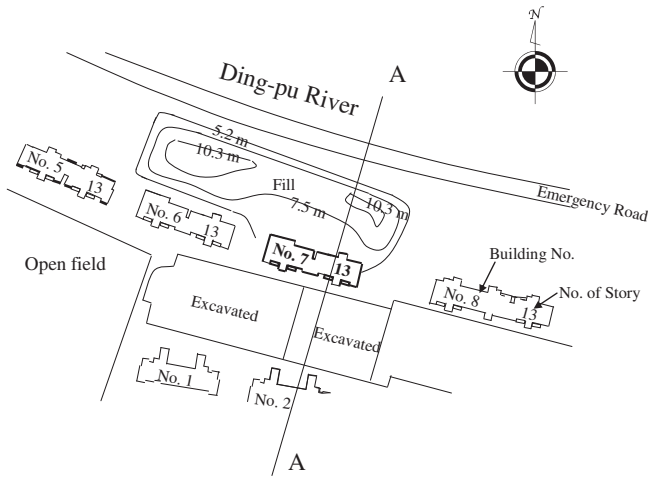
Plan view of the development area and the location of the building failure (modified from Zhu et al. [18]).
